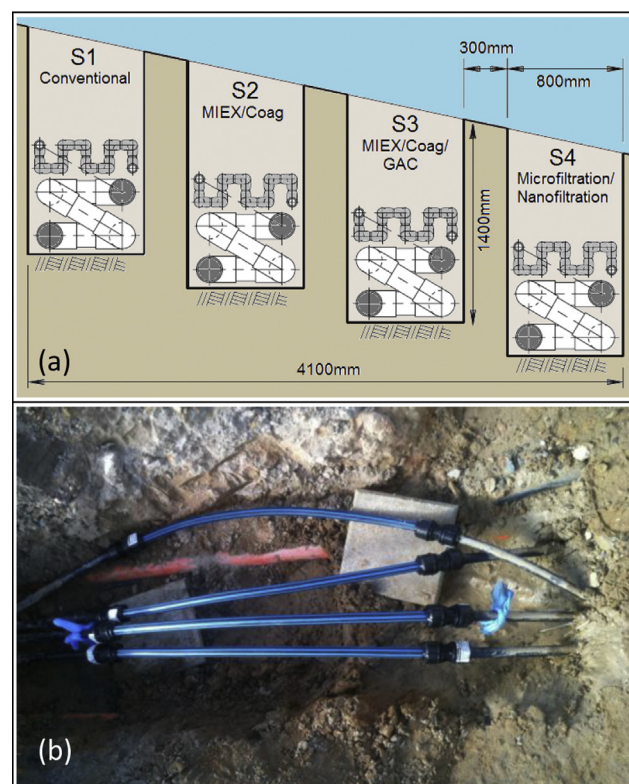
(a) Pilot distribution system cross-section layout and (b) Replaced 20 mm PE autopsy sections from supply pipes immediately preceding PDS inlet.
